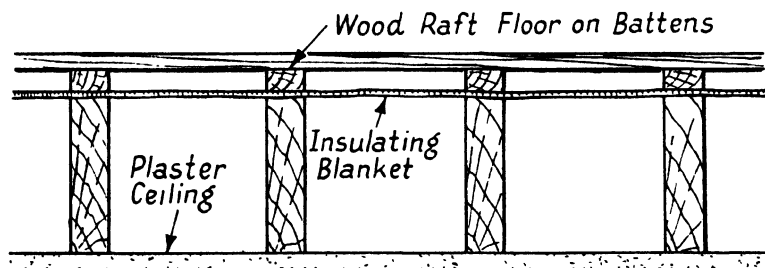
WOOD FLOATING FLOOR ON UNCOVERED JOISTS
